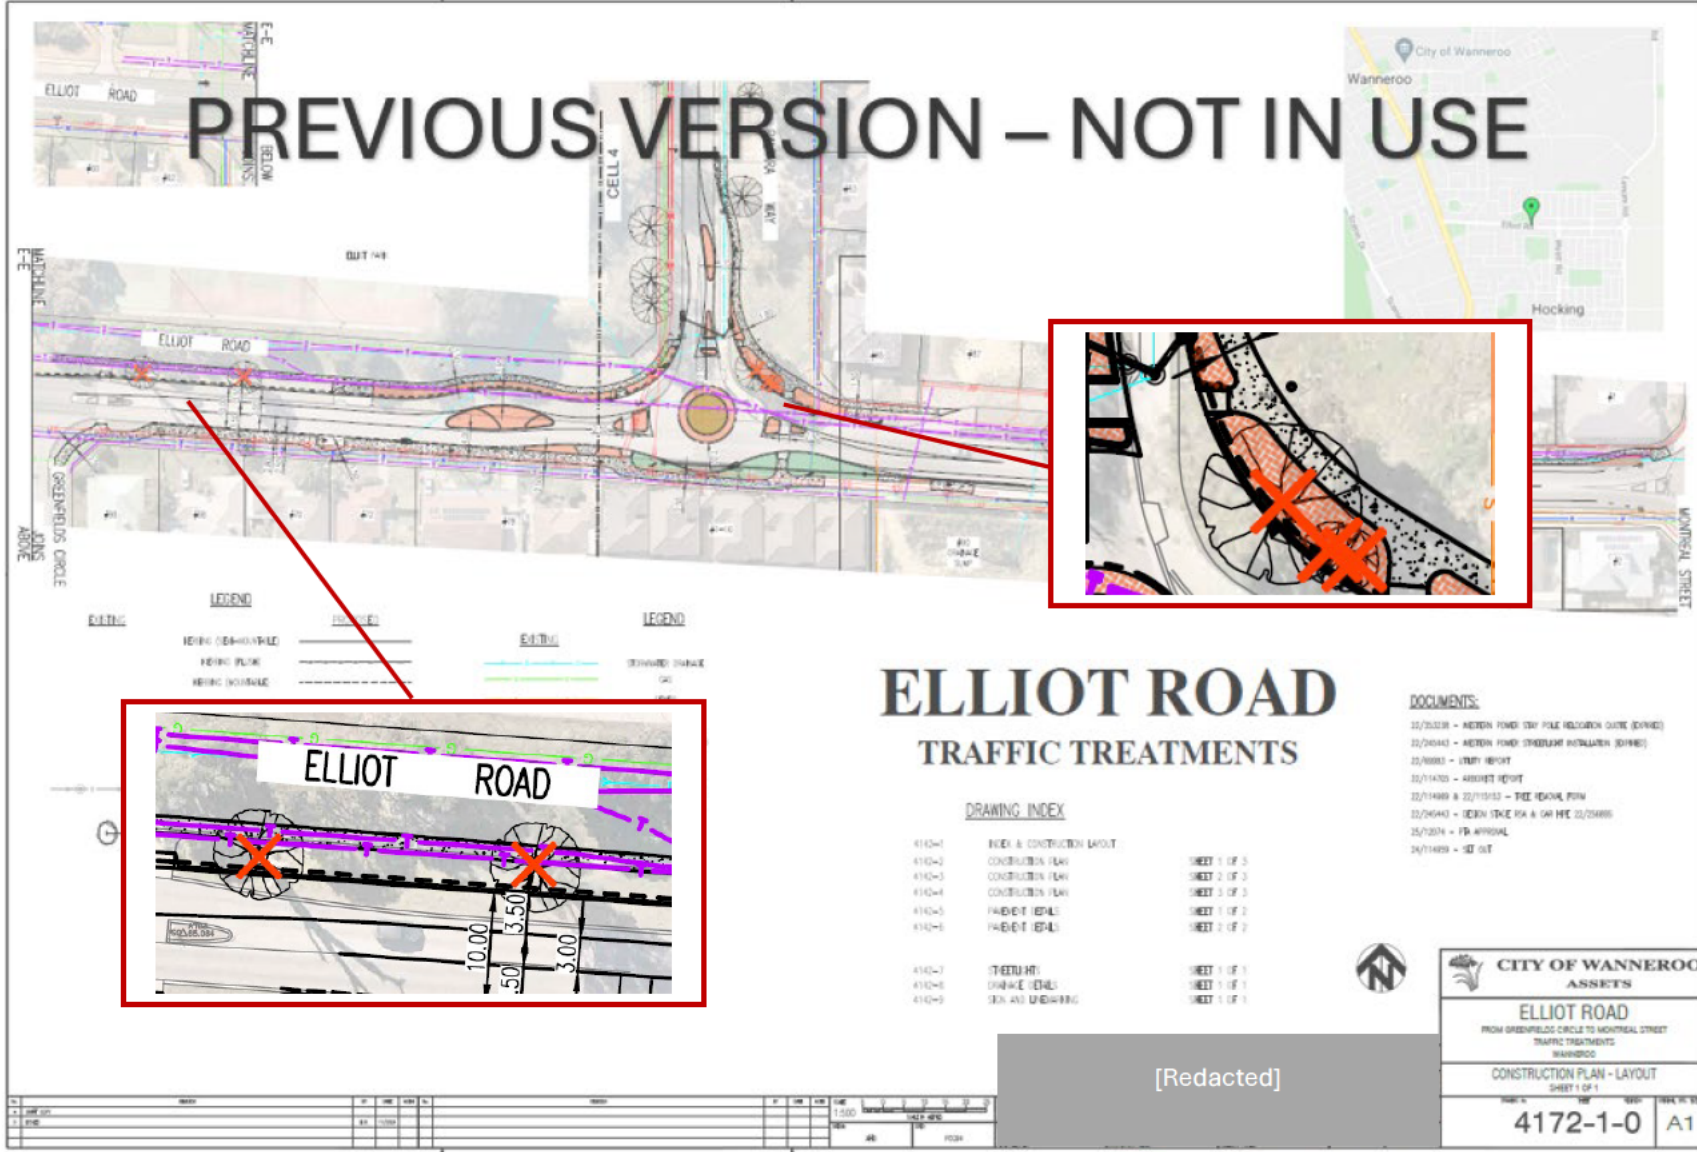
A Previous version of construction plan (January 2025) with insets of the plan to show the five (5) trees originally proposed to be cleared.
